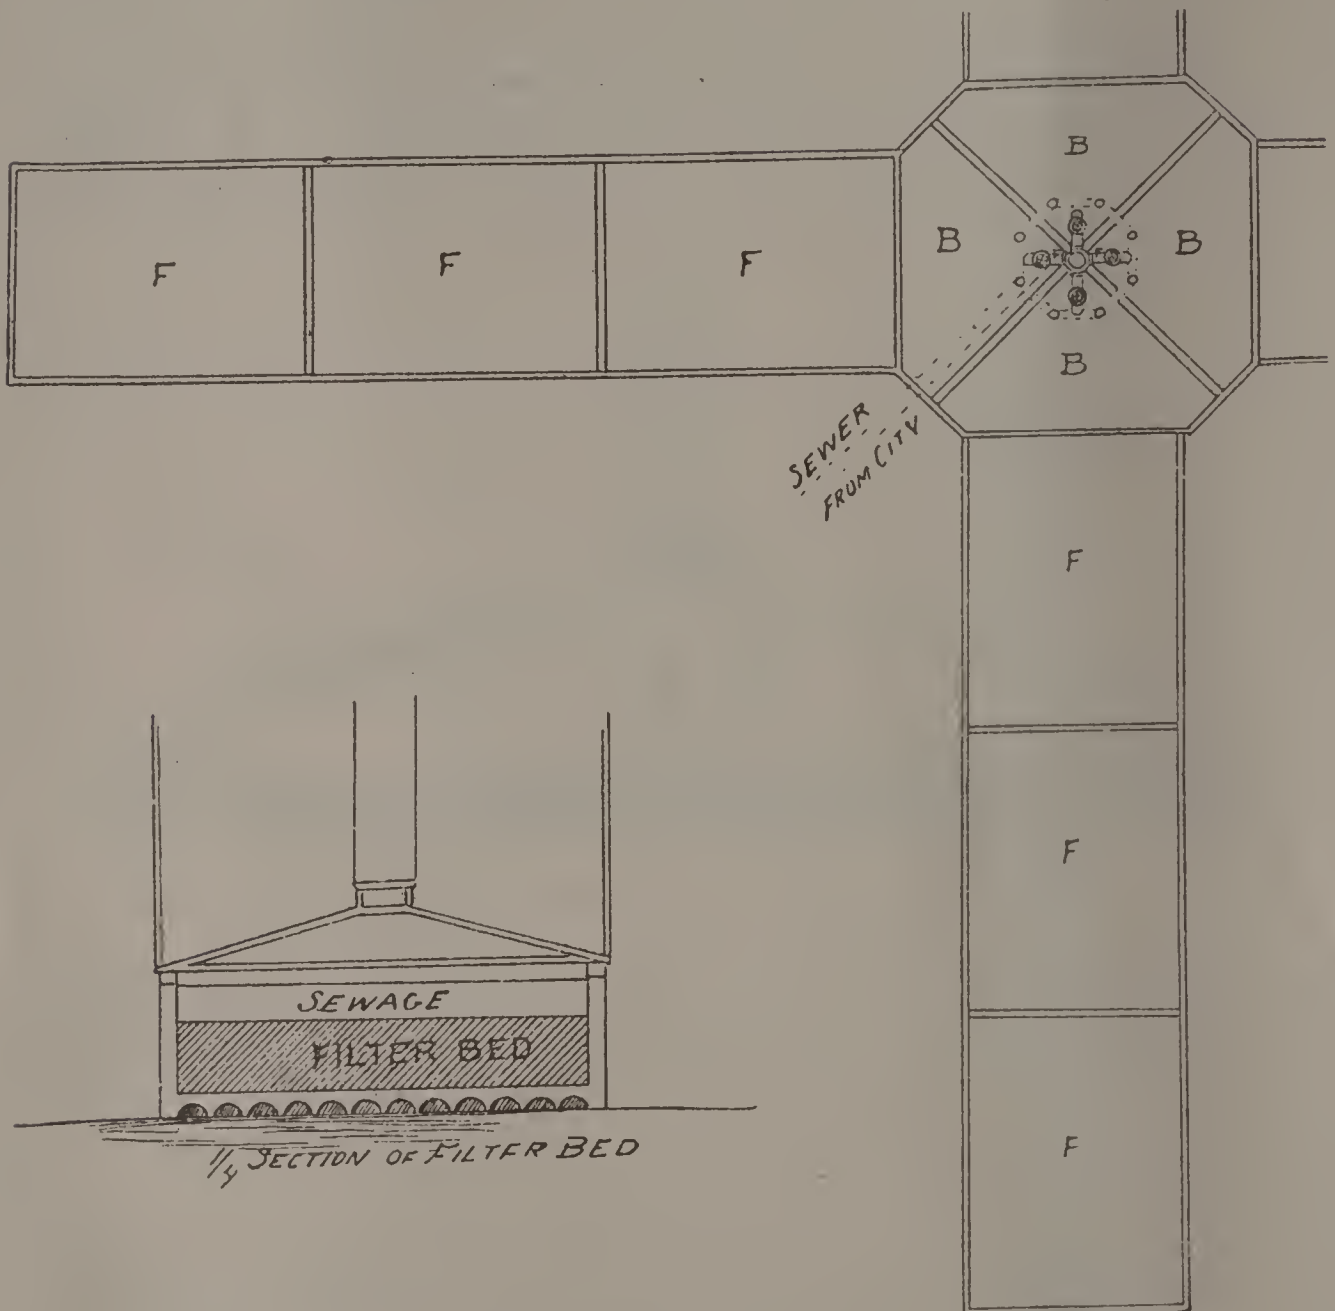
SHOWING SECTIONS OF SEWAGE BEDS.
